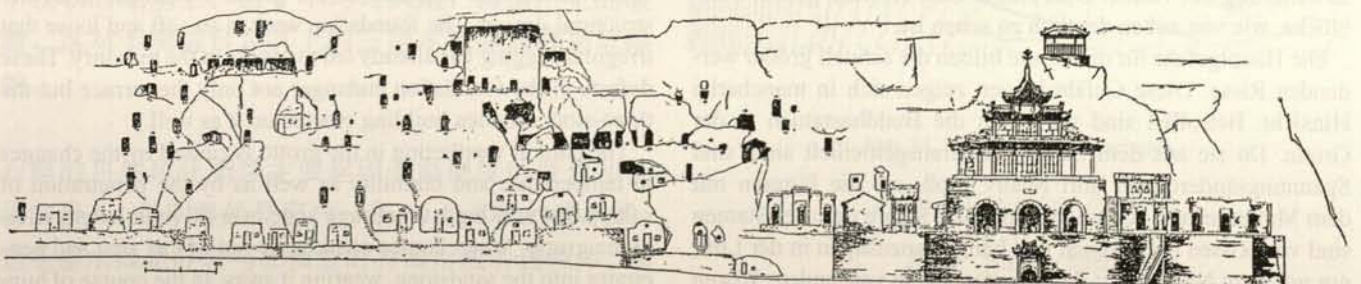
Elevation of the north wall (entrance wall) inside the grotto of the Great Buddha
